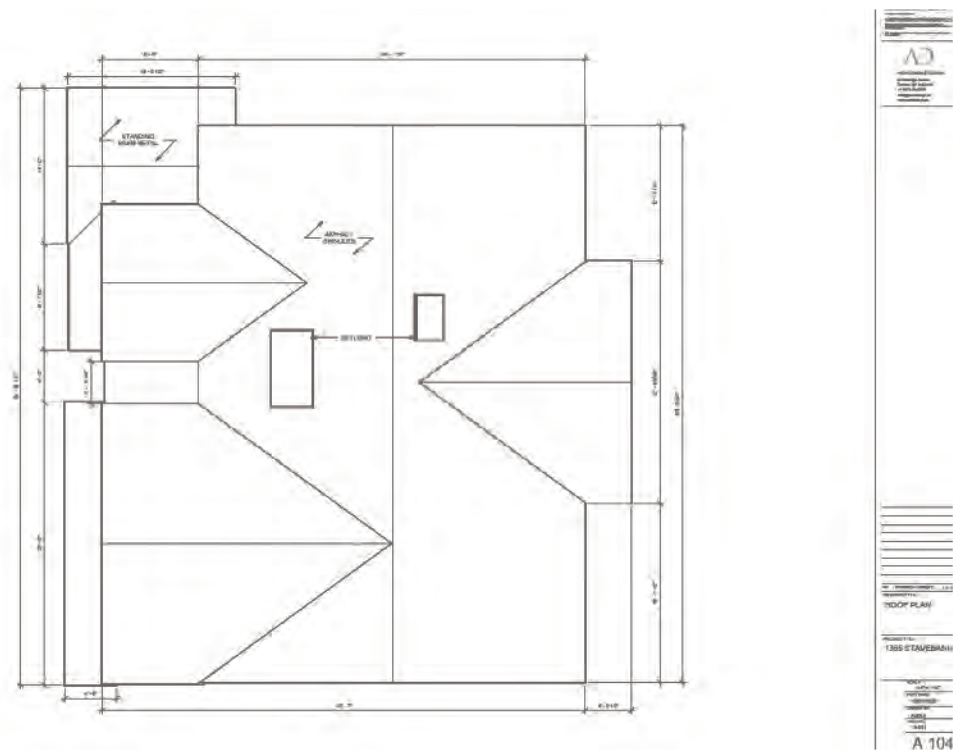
Proposed Roof Plan (AEON Design Studio, Inc., 2019)
